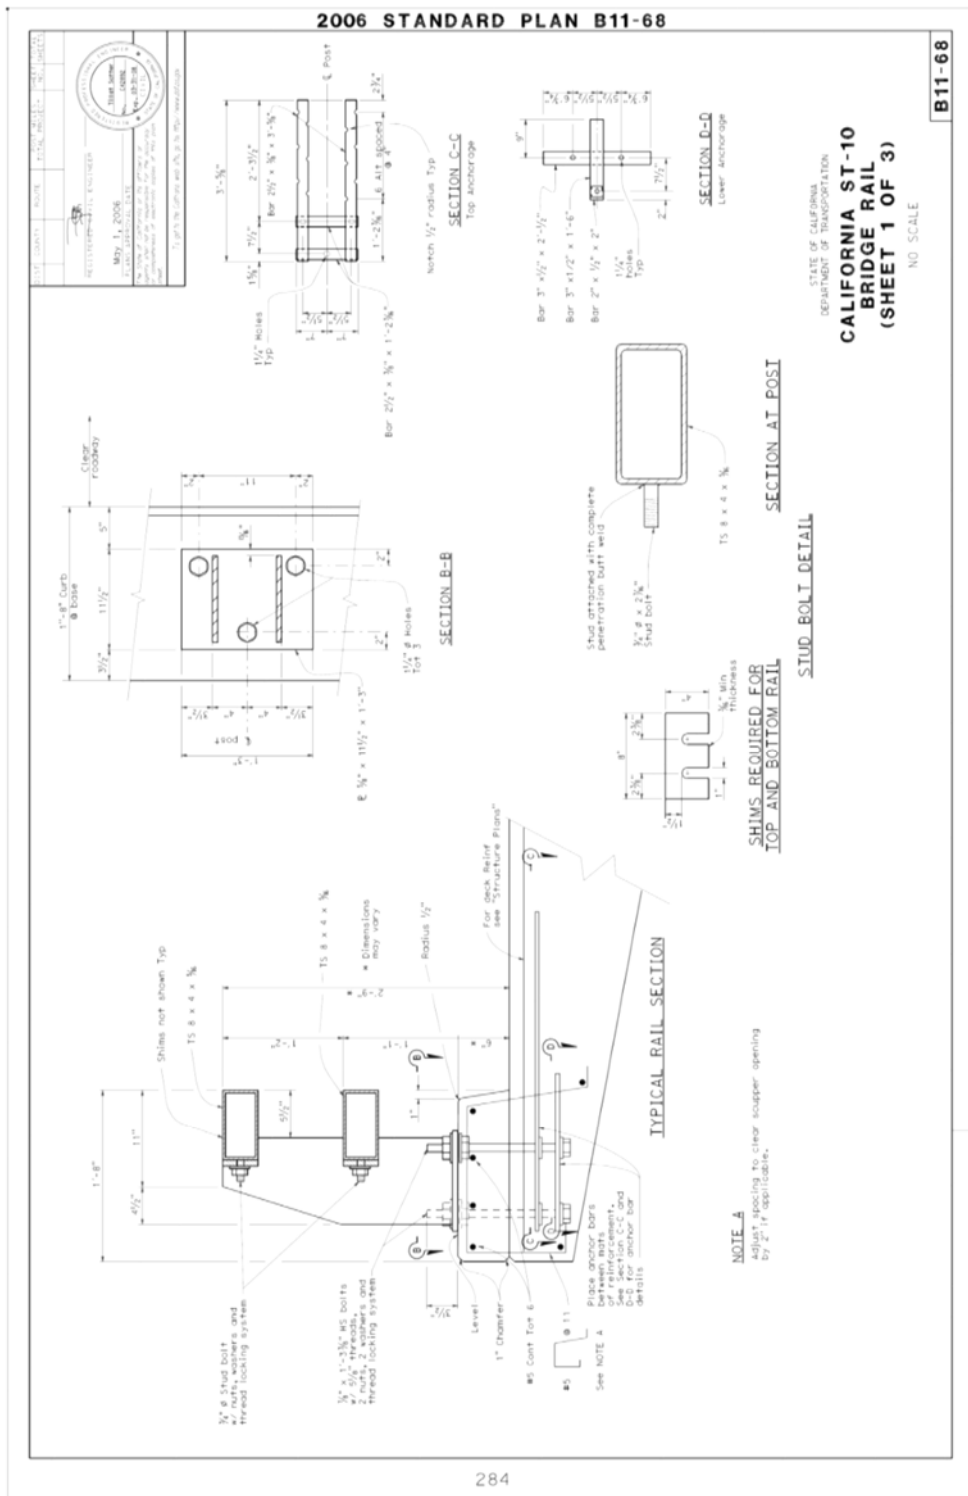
California Standard Plan for the ST-10 Bridge Rail Sheet 1 of 3
